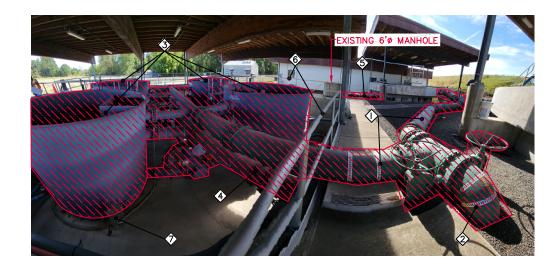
PHOTO: EXISTING GRAVITY FILTERS AND PIPING 2
